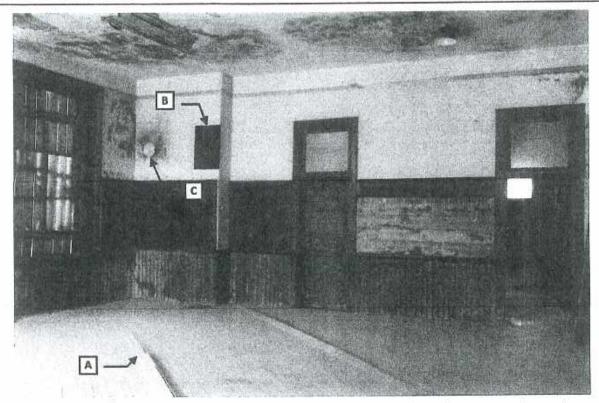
Room 1 view north. (A) Floorboards are warped, (B) Heating vent, (C) Wood burning stove duct opening.
